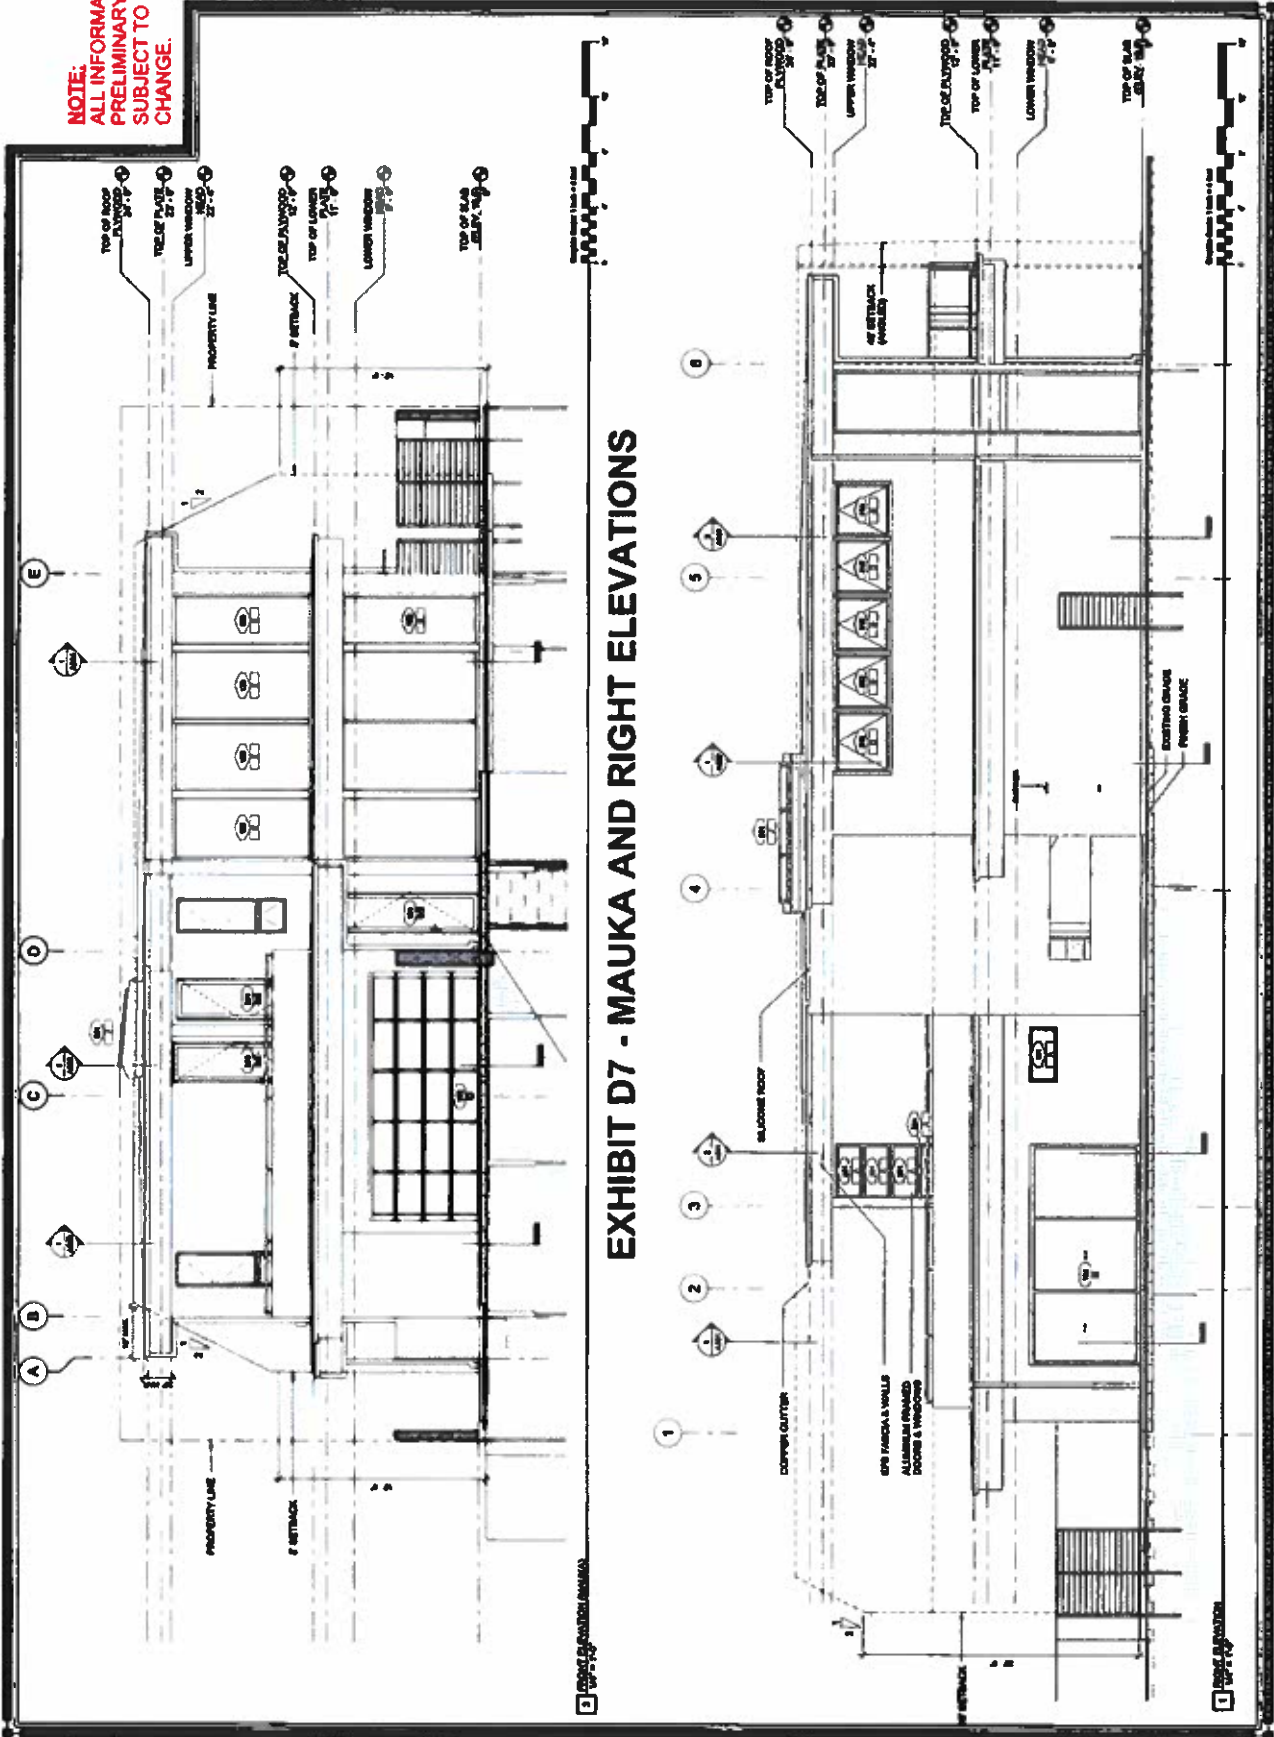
MAUKA AND RIGHT ELEVATIONS
